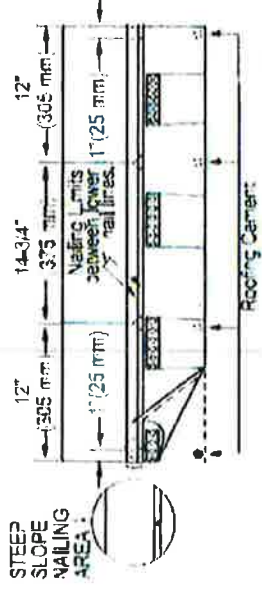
Use six nails and four spots of asphalt roofing cement on steep slopes.
